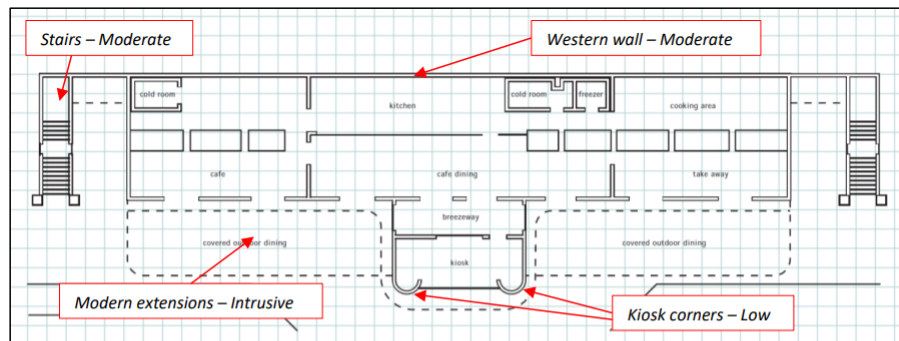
Location of significant elements at the ground floor of the pavilion (MBRC 2006: 9).
